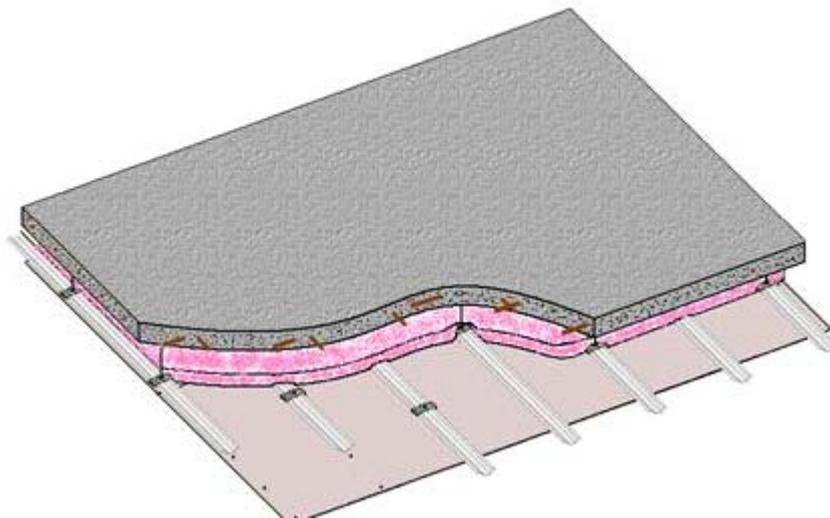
150mm concrete slab floor with ceiling. Ceiling consists of 1 layer of plasterboard attached to concrete through RSIC clips, with 100mm of fibreglass batts in cavity.
